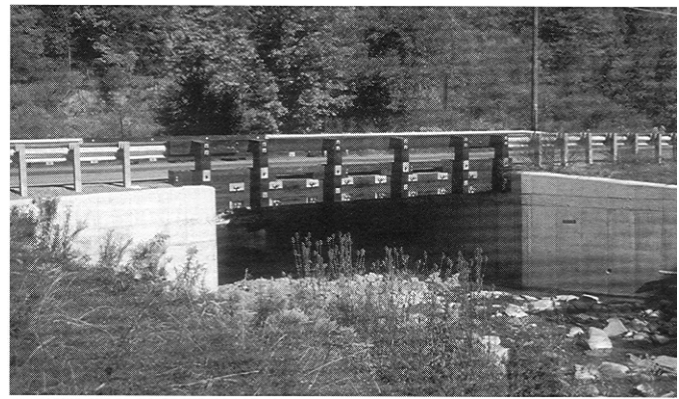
Christian Hollow stress-laminated box-beam timber bridge located in Steuben County, New York.
